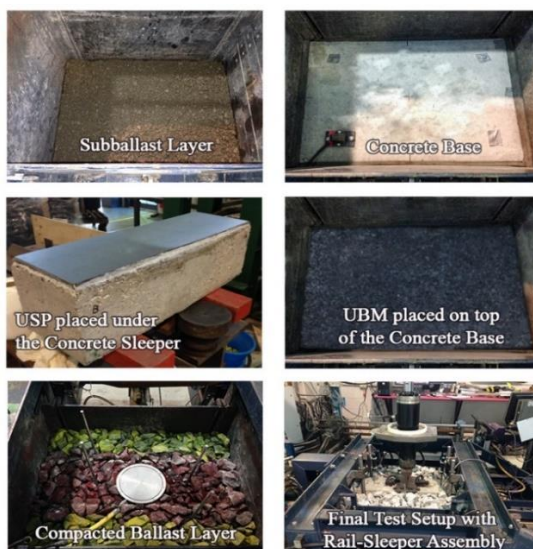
Photographs of cyclic load test (ballast-concrete interface with and without USP and UBM)
